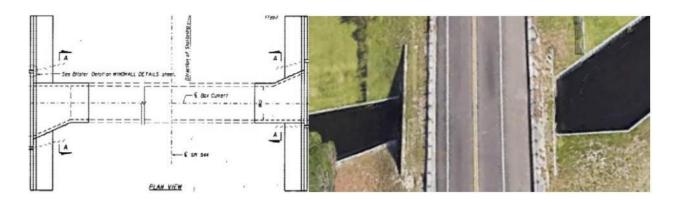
Plan View and Aerial View of SR 544 Culvert at Conine-Smart Canal
